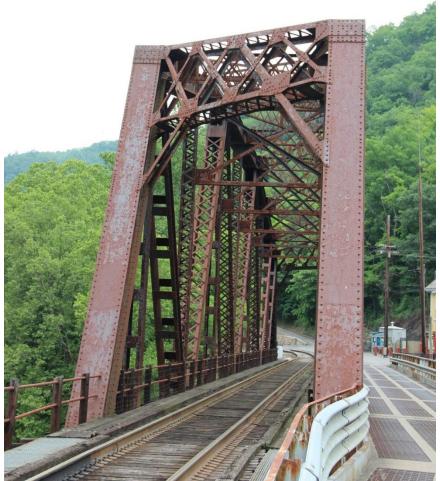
SKEWED SOUTH PORTAL OF MAIN WARREN TRUSS SPAN, FACING NORTH.
